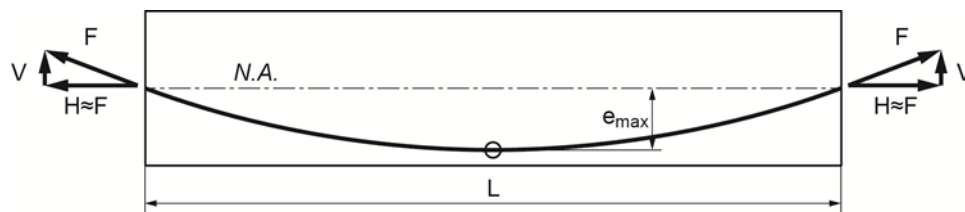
Simple Span Beam with Parabolically Draped Tendon
